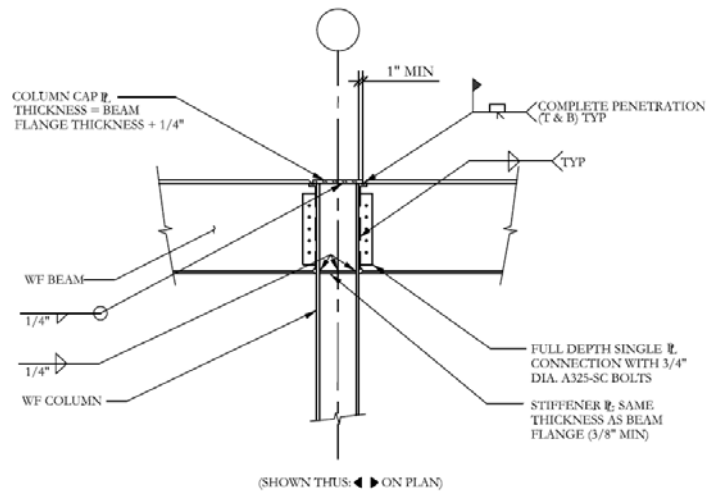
Existing Steel Structural System Column Flange Moment Connection Detail
